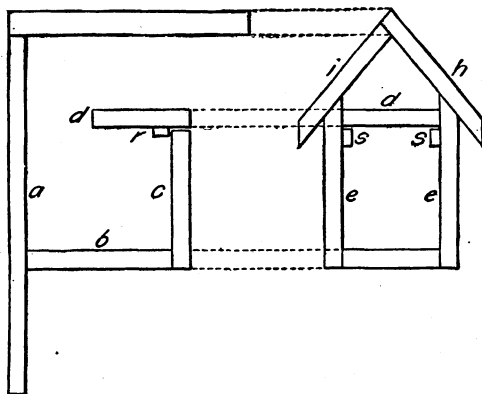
Sections of house shown in figure 29. Upper floor removable.
